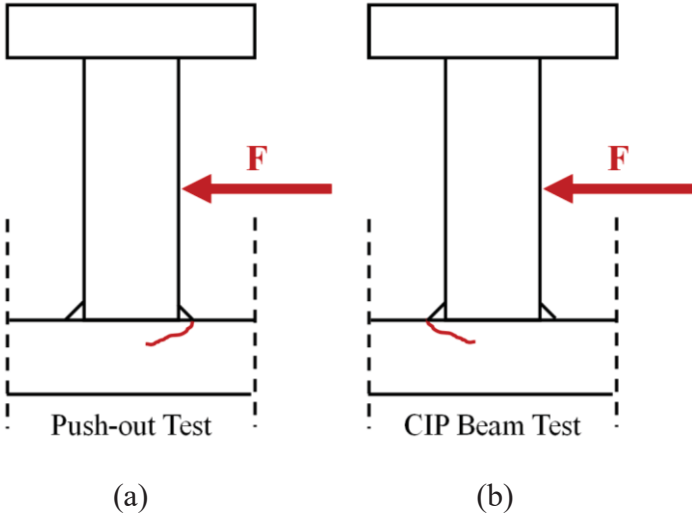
Typical fatigue failures for (a) push-out test and (b) beam test.
